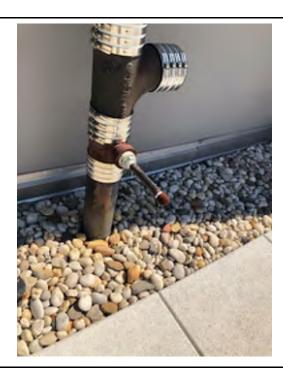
V2 riser and sample port in good condition, facing northeast. 8 April 2021.
